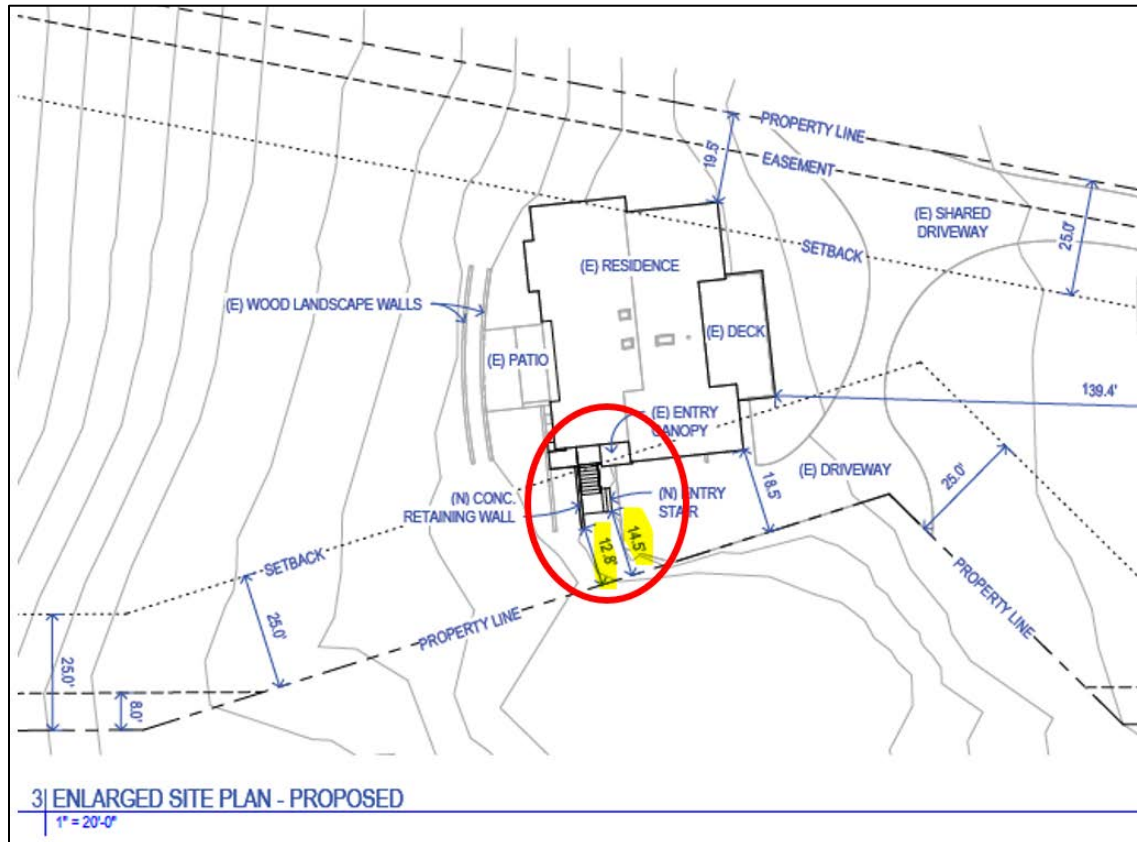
Site Plan showing proposed improvements of the retaining wall and entry stairs (circled in red). The plans indicate the proposed replacement of the retaining wall and entry stairs will reduce the encroachment of both structures from what currently exists.
